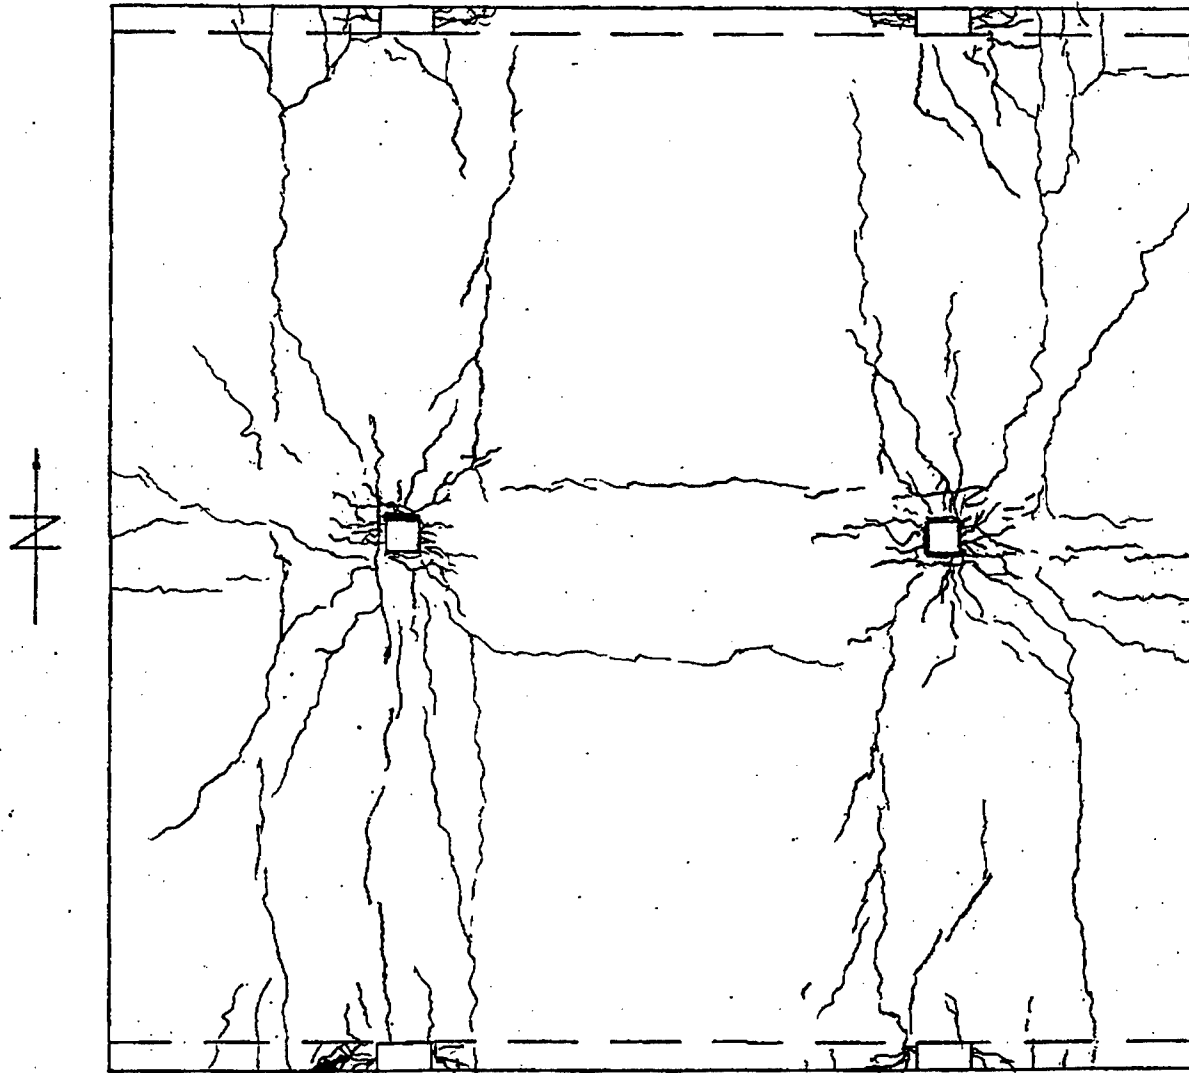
Crack Pattern, Second Floor Slab, Top Side, Post-E200N
